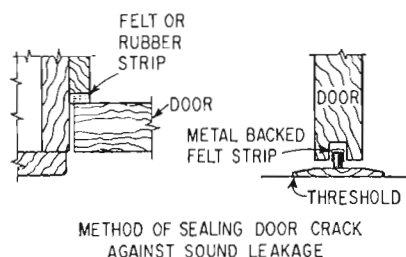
Normal methods for sealing the control-room door. The door itself should be of a heavy type to improve isolation of the control room.
